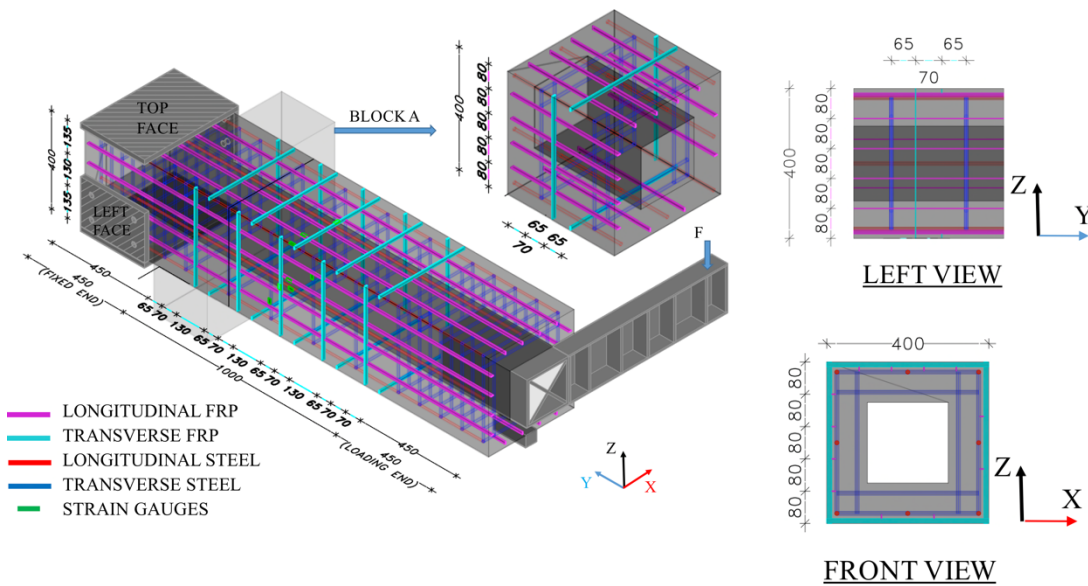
Beam details: a) Cross section; b) Longitudinal details (dimensions in mm)
